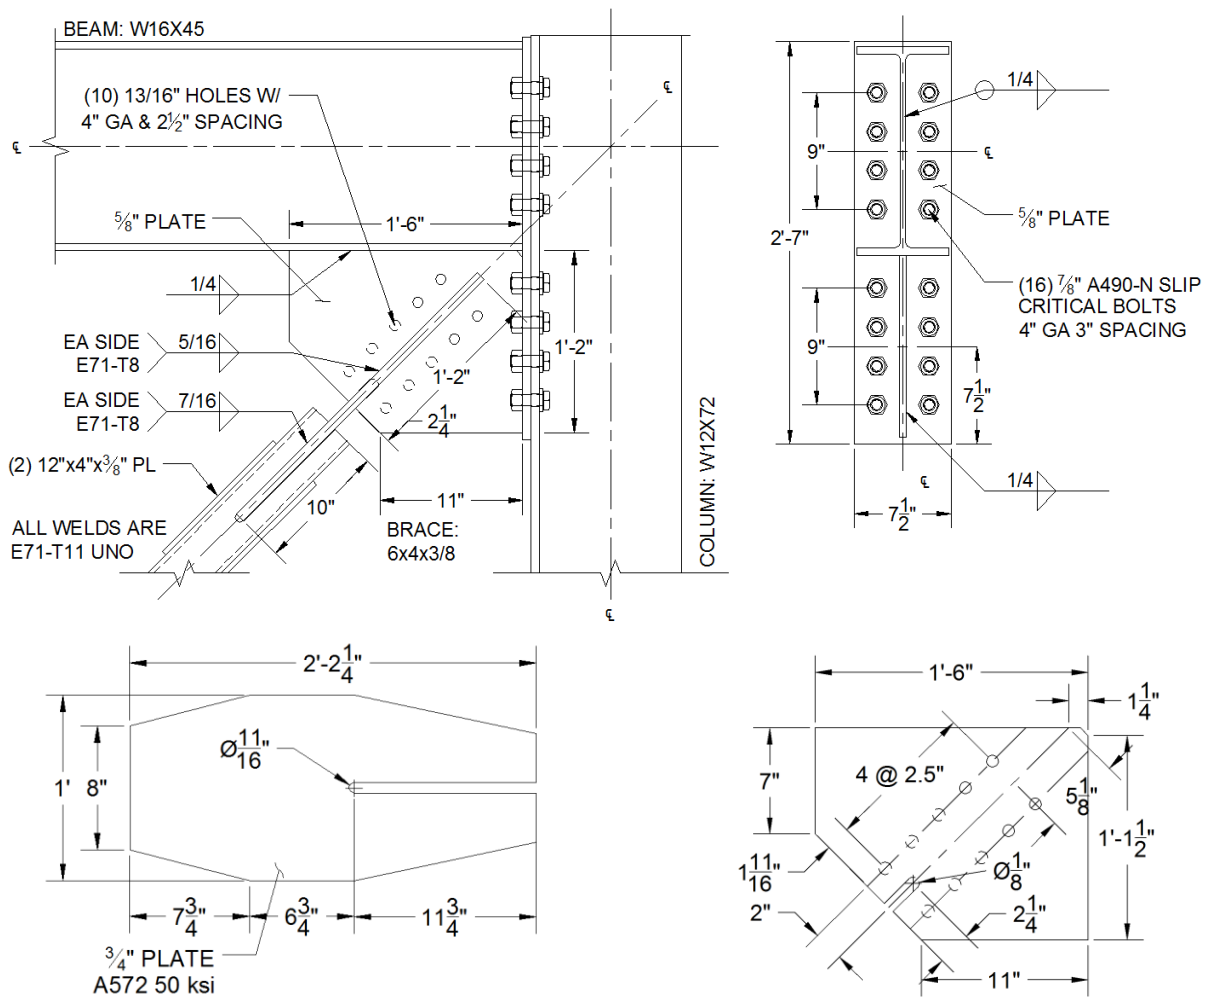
Specimen NCBF4-R2 Connection Detail
